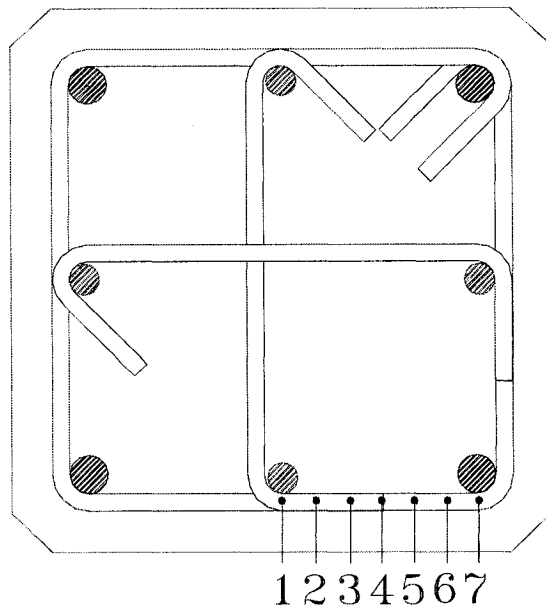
Hoop Strain Locations for Column Section Models.
